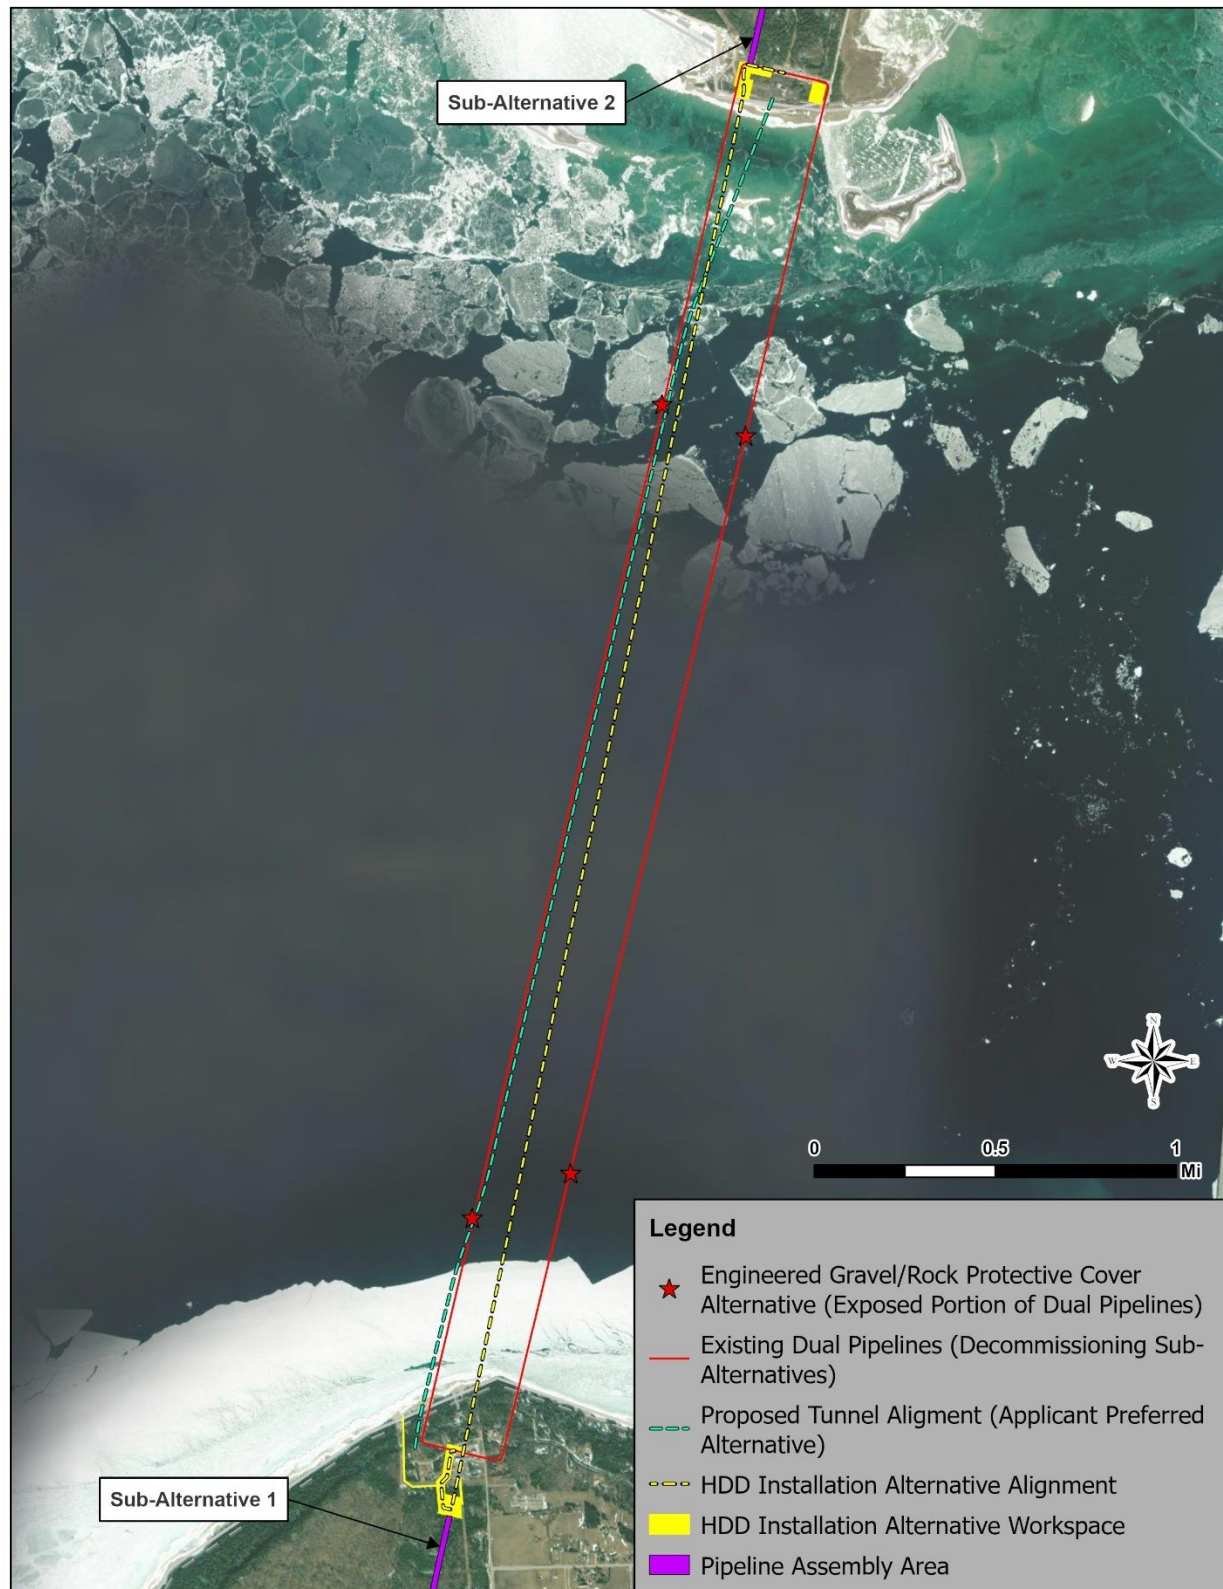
HDD Installation Alternative Alignment Underneath the Straits
